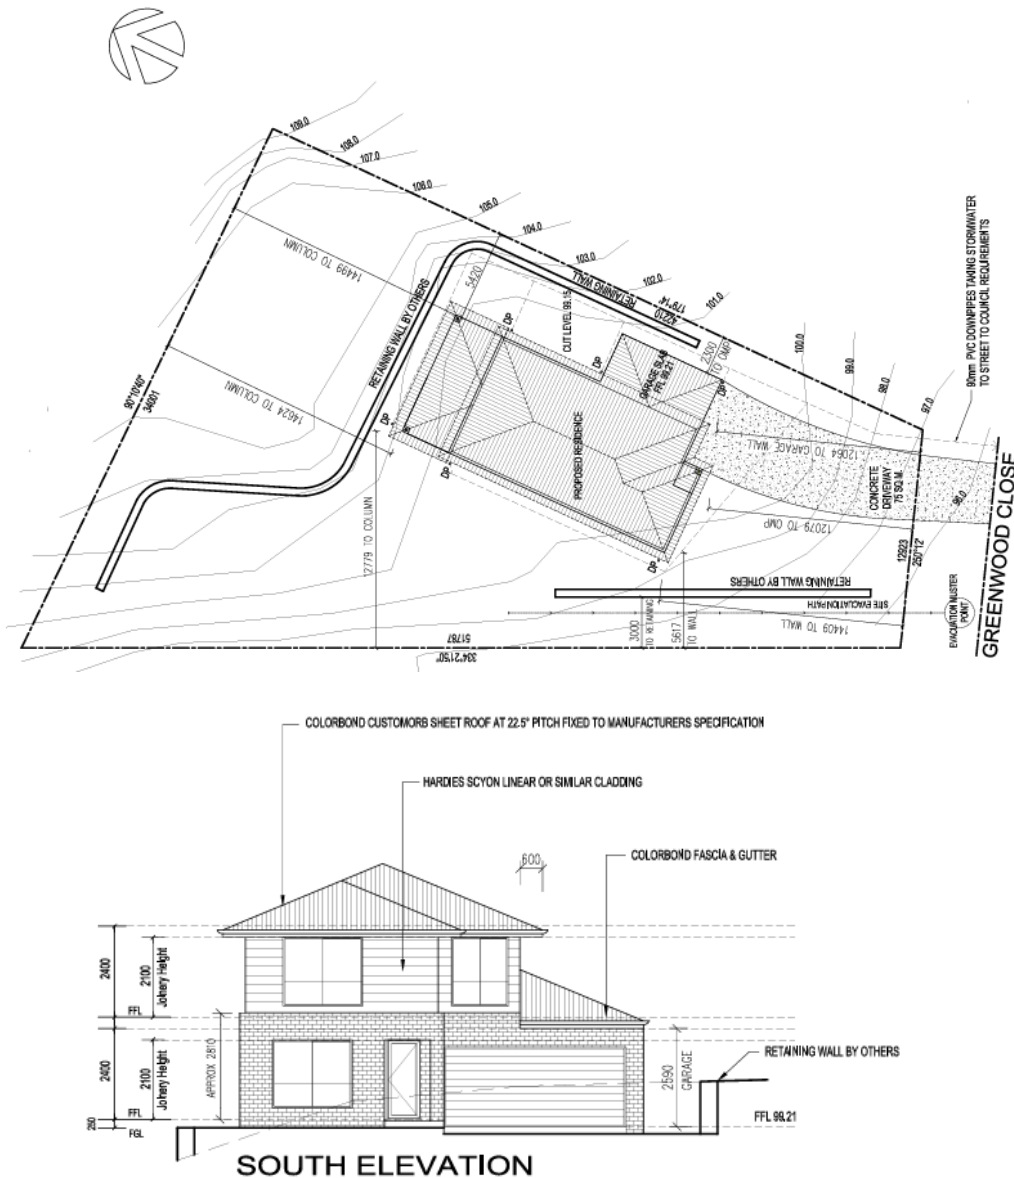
Preliminary Project Drawings (Source: Hotondo Homes, Drawing No. 25521, dated 26/02/2026)
